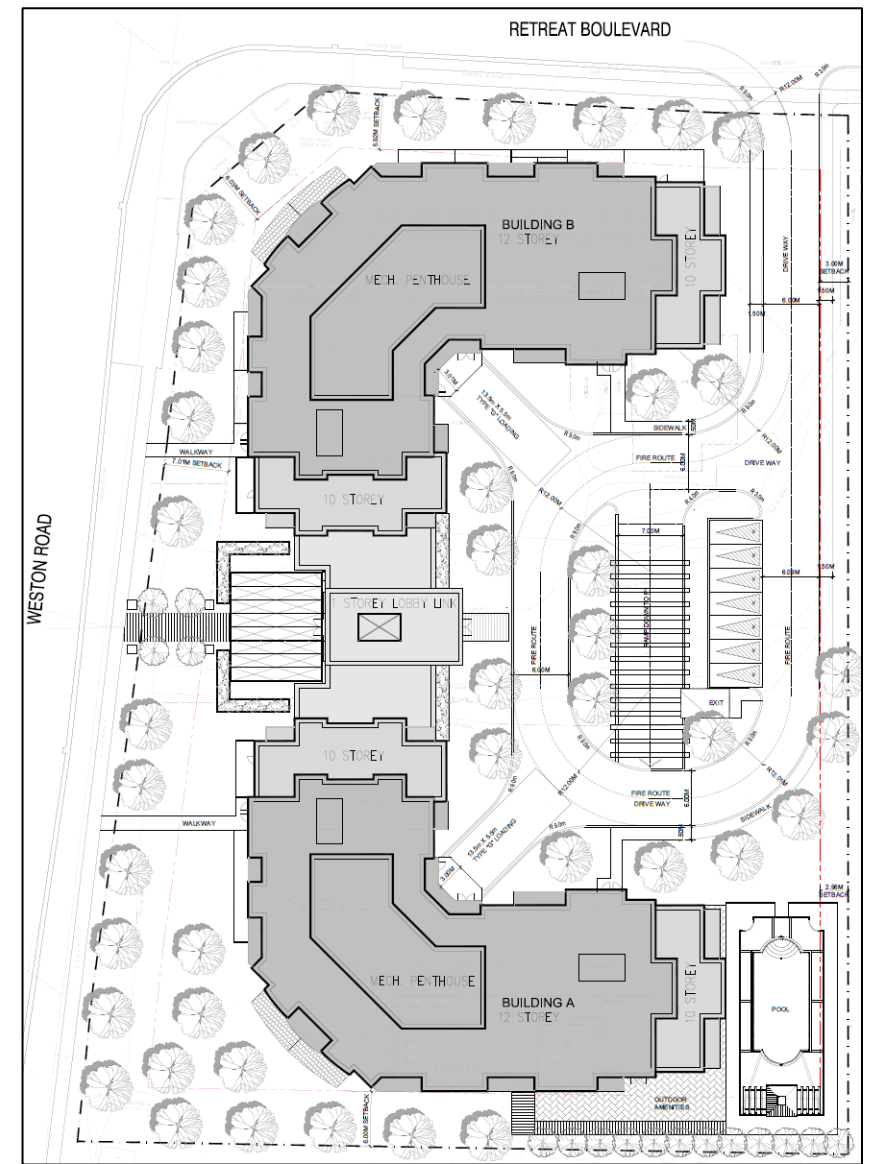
Original Site Plan (1st Submission, Dec., 19, 2011)
